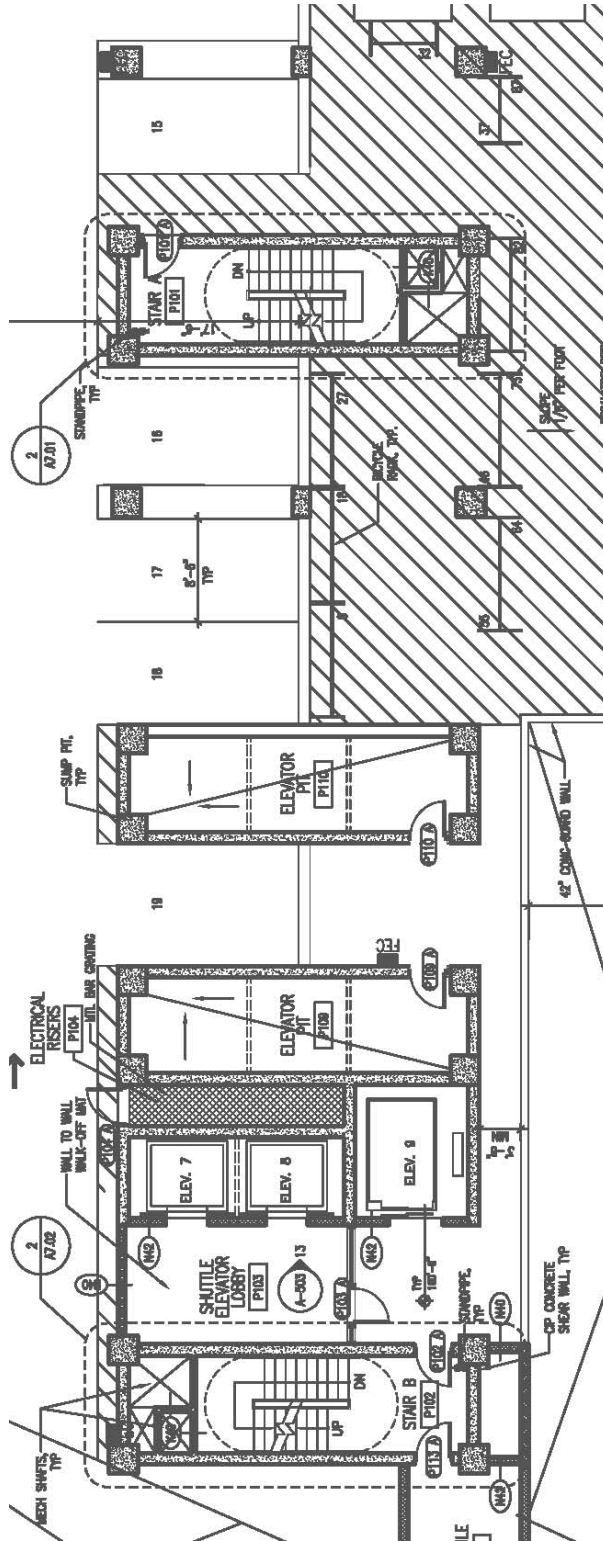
Revised Parking Garage P1 Level Service Core Plan
